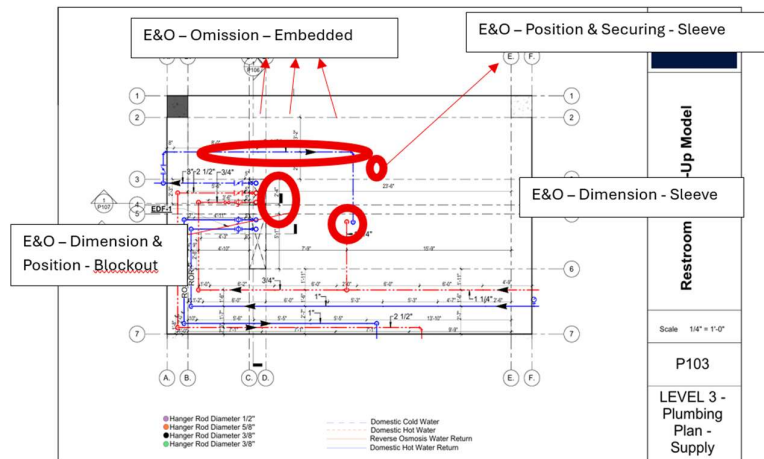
Floor Plan 3rd Level – Water Supply Plumbing drawings
